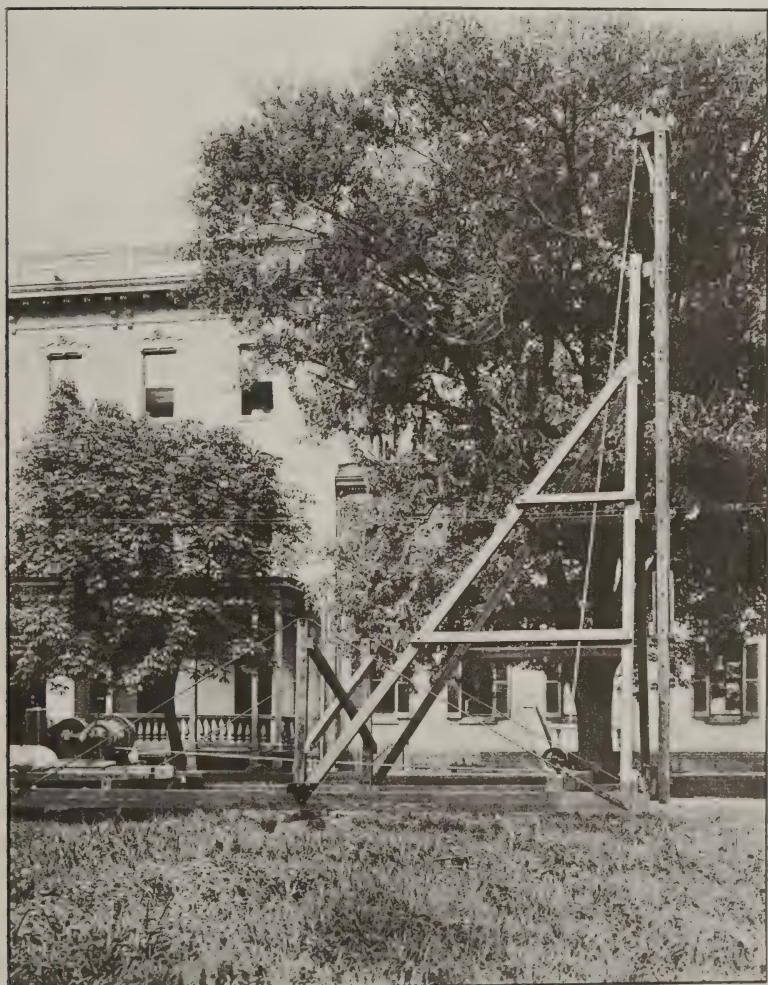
Side View of Pile Driver, Showing Position of Motor and Lines
